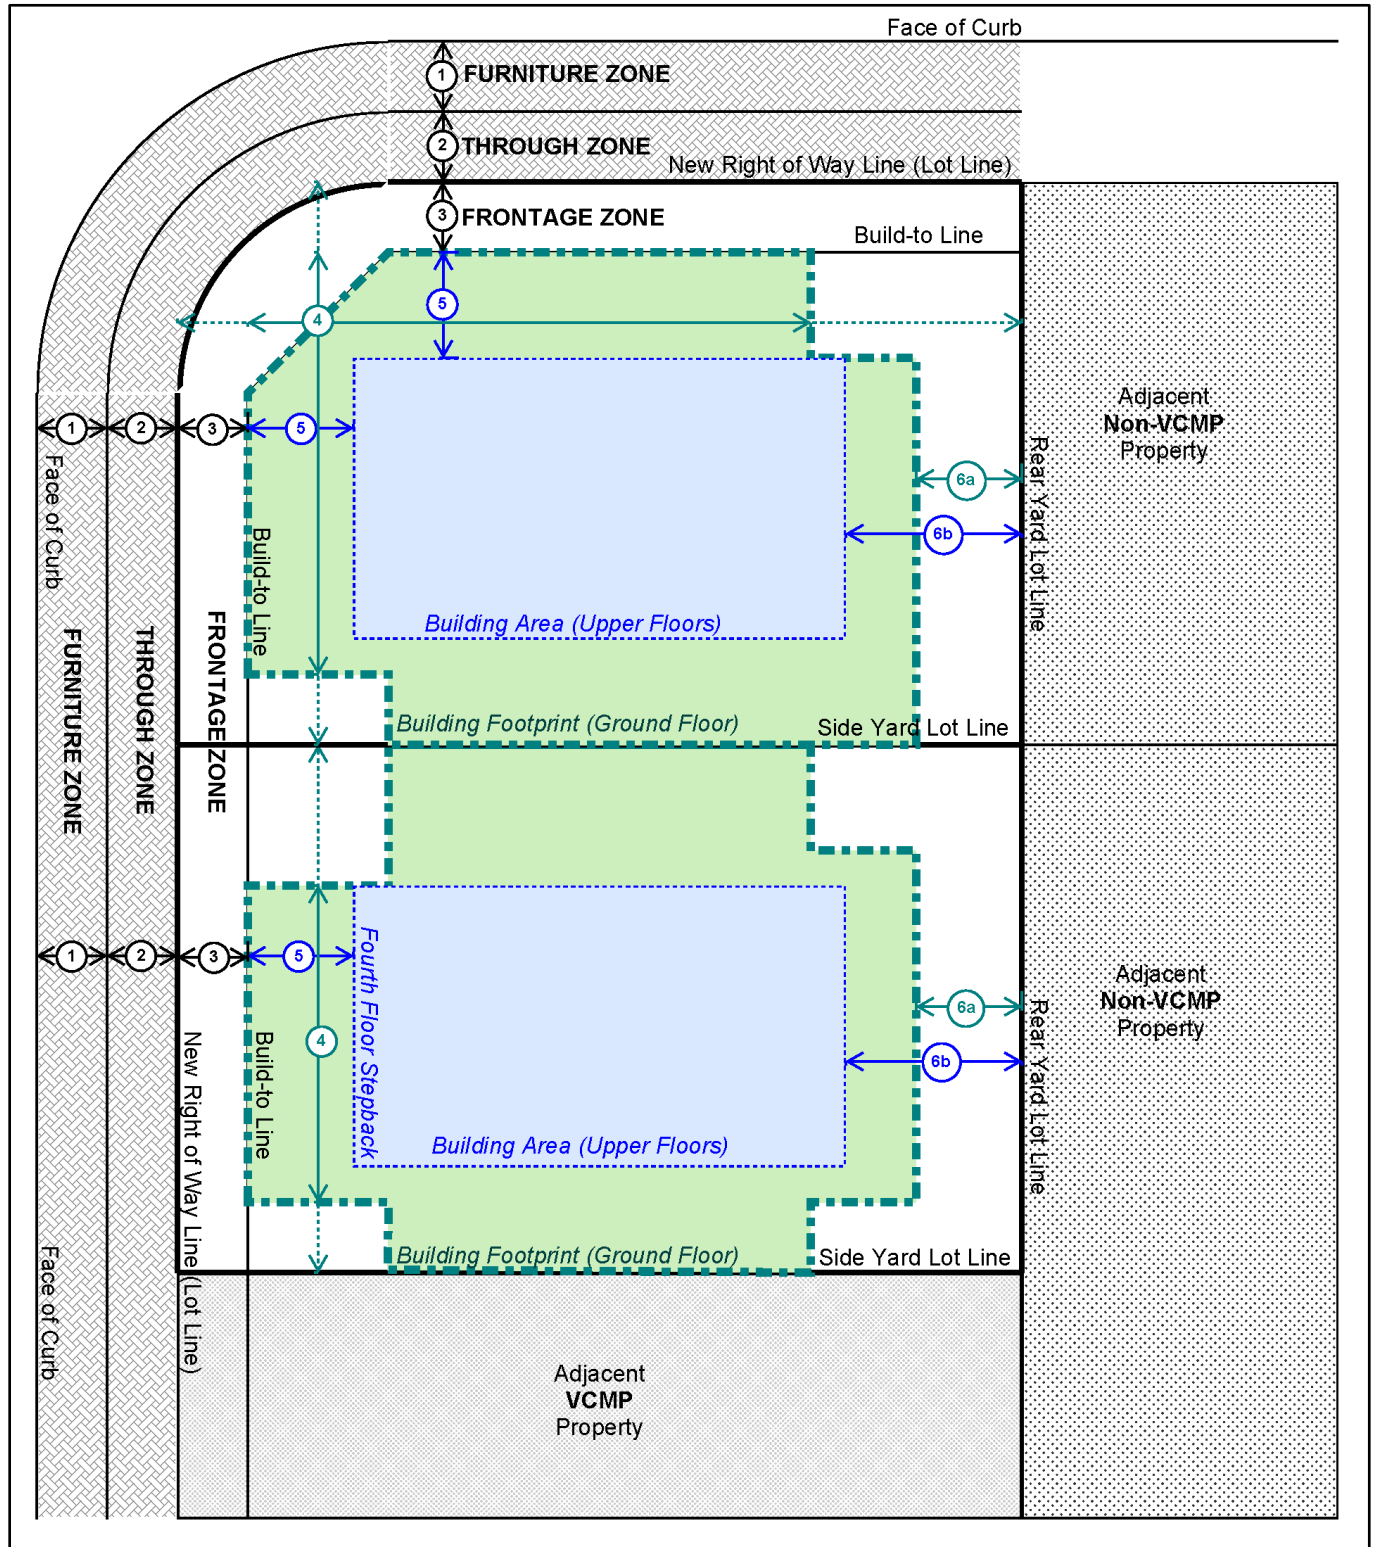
Property Frontage and Buildable Area Requirements (Site Plan View)
